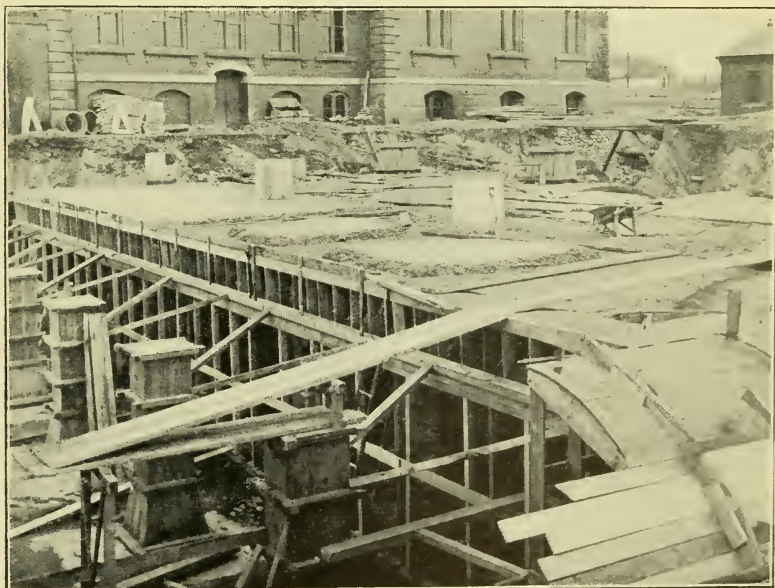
Forms for Piers and Vaulting, looking Northeast, Nov. 15, 1906.
